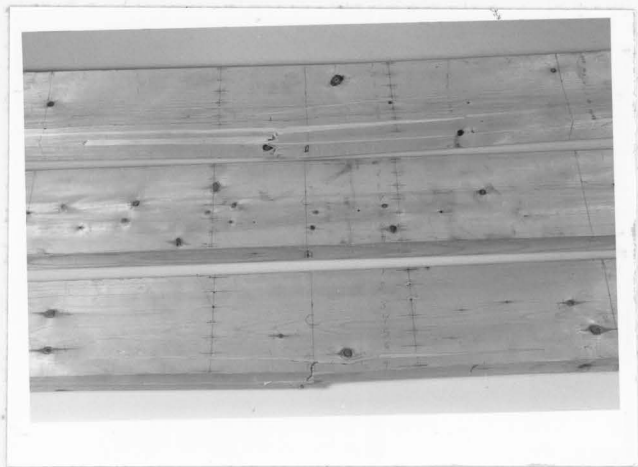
TYPICAL FAILURE IN 2 x 6 KNOTTED BEAMS SUBJECTE
